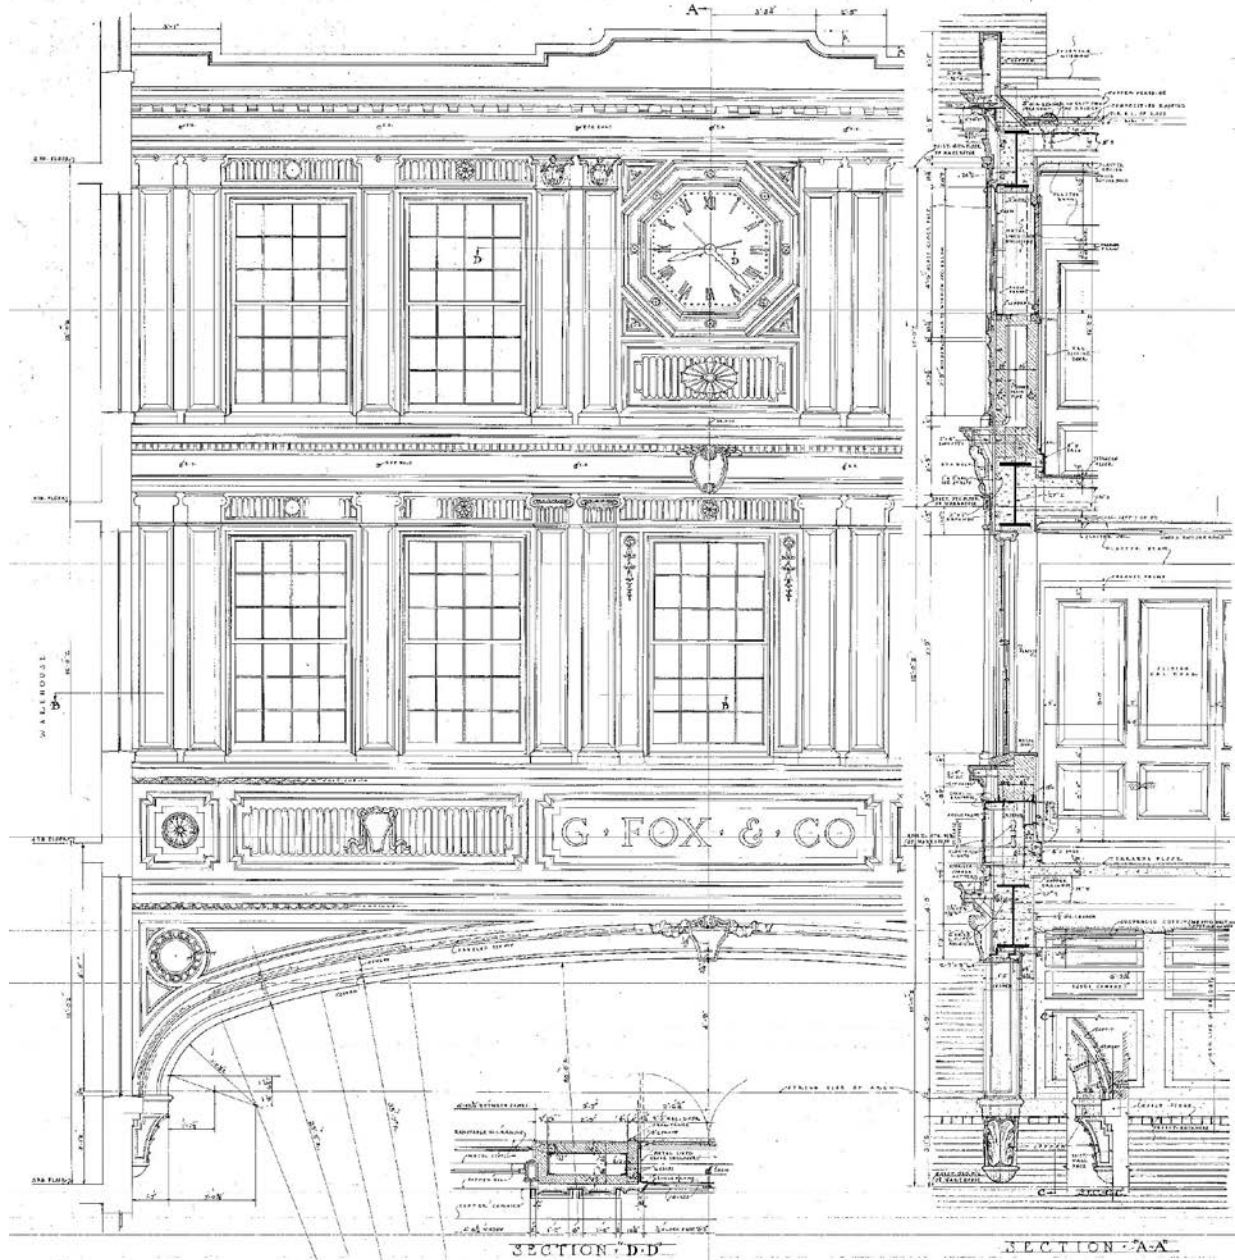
“Connecting Bridge for G. Fox & Co. Inc. Hartford Conn.” By Abbot Merkt & Co. Inc. Engineers & Architects, 175 Fifth Ave, New York, April 18, 1930. Plans stamped “Received” by the Building Department May 7, 1930, found on the Hartford GIS scanned document viewer, depict the bridge design and construction and indicate it was built in 1930 rather than 1918 as indicated by the National Historic District Nomination. The above sections convey the level of detail in the bridge design and the connection of the bridge to the Warehouse Building. The complete drawing set is included as attachment 6.
